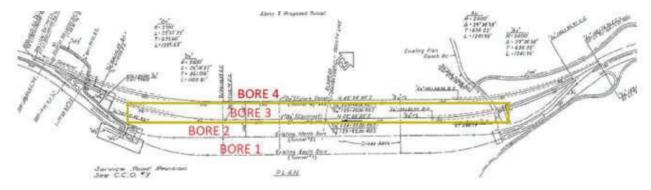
Caldecott tunnel site plan, showing location of bore 3 within the tunnel
